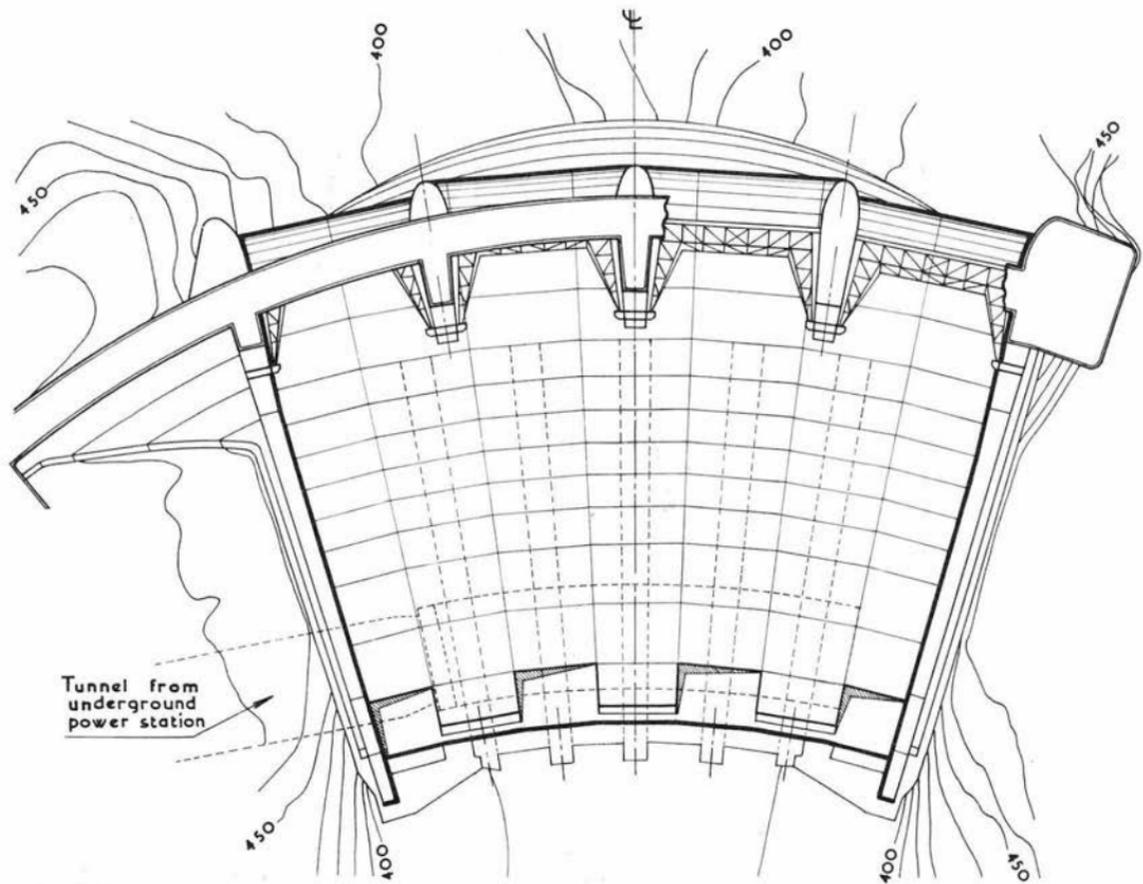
PICOTE — PLAN OF THE DAM AND SPILLWAY
